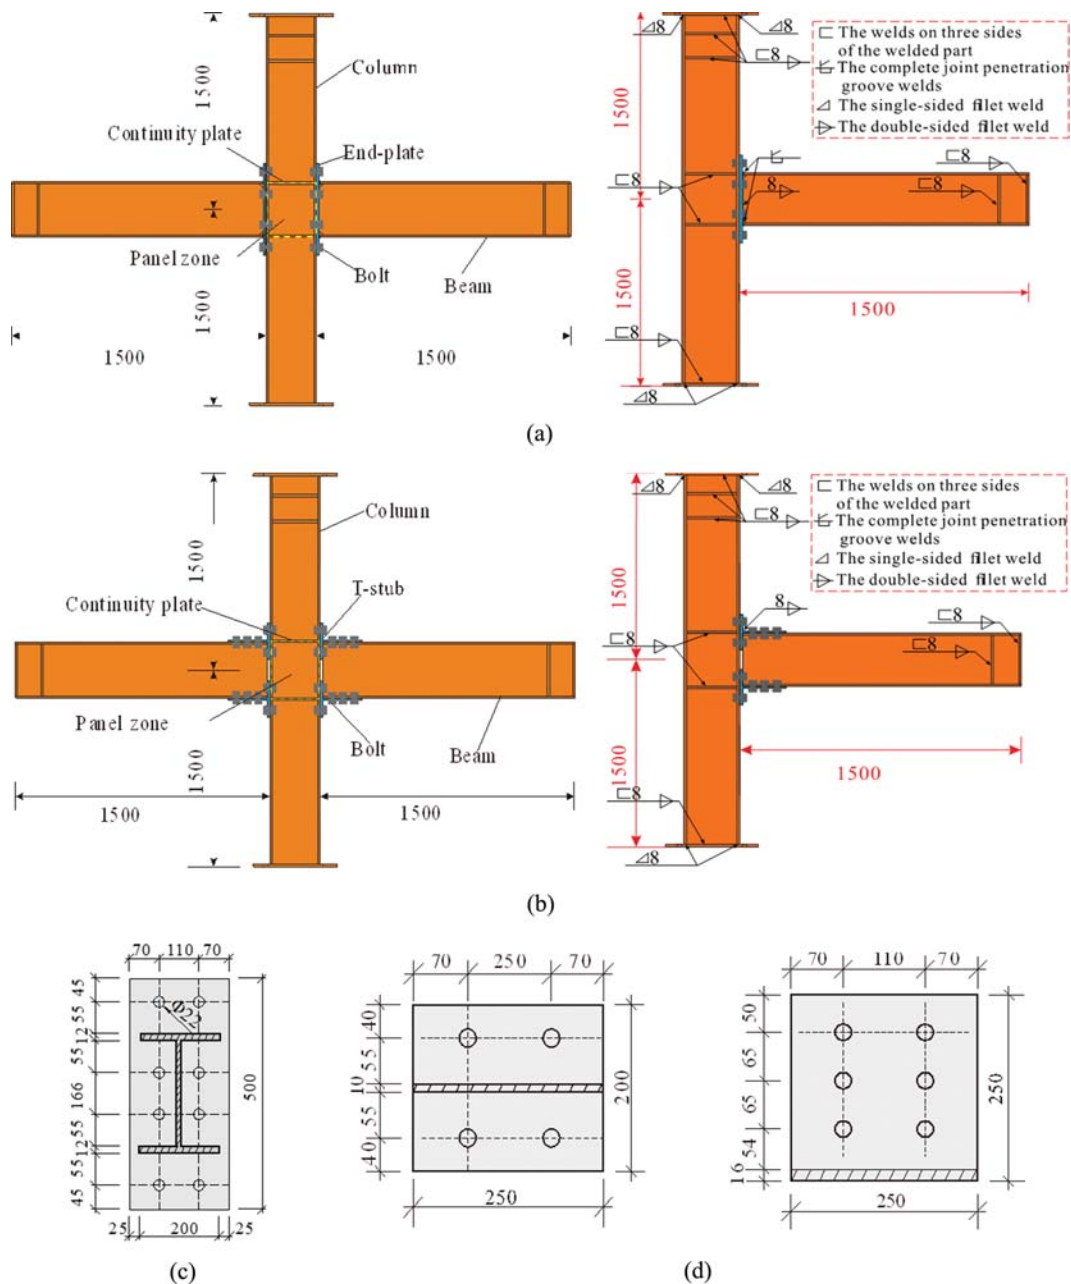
Test Specimen Details. (a) End-Plate Connection (Interior; Exterior), (b) T-Stub Connection (Interior; Exterior), (c) End-Plate Details, (d) T-Stub Details
